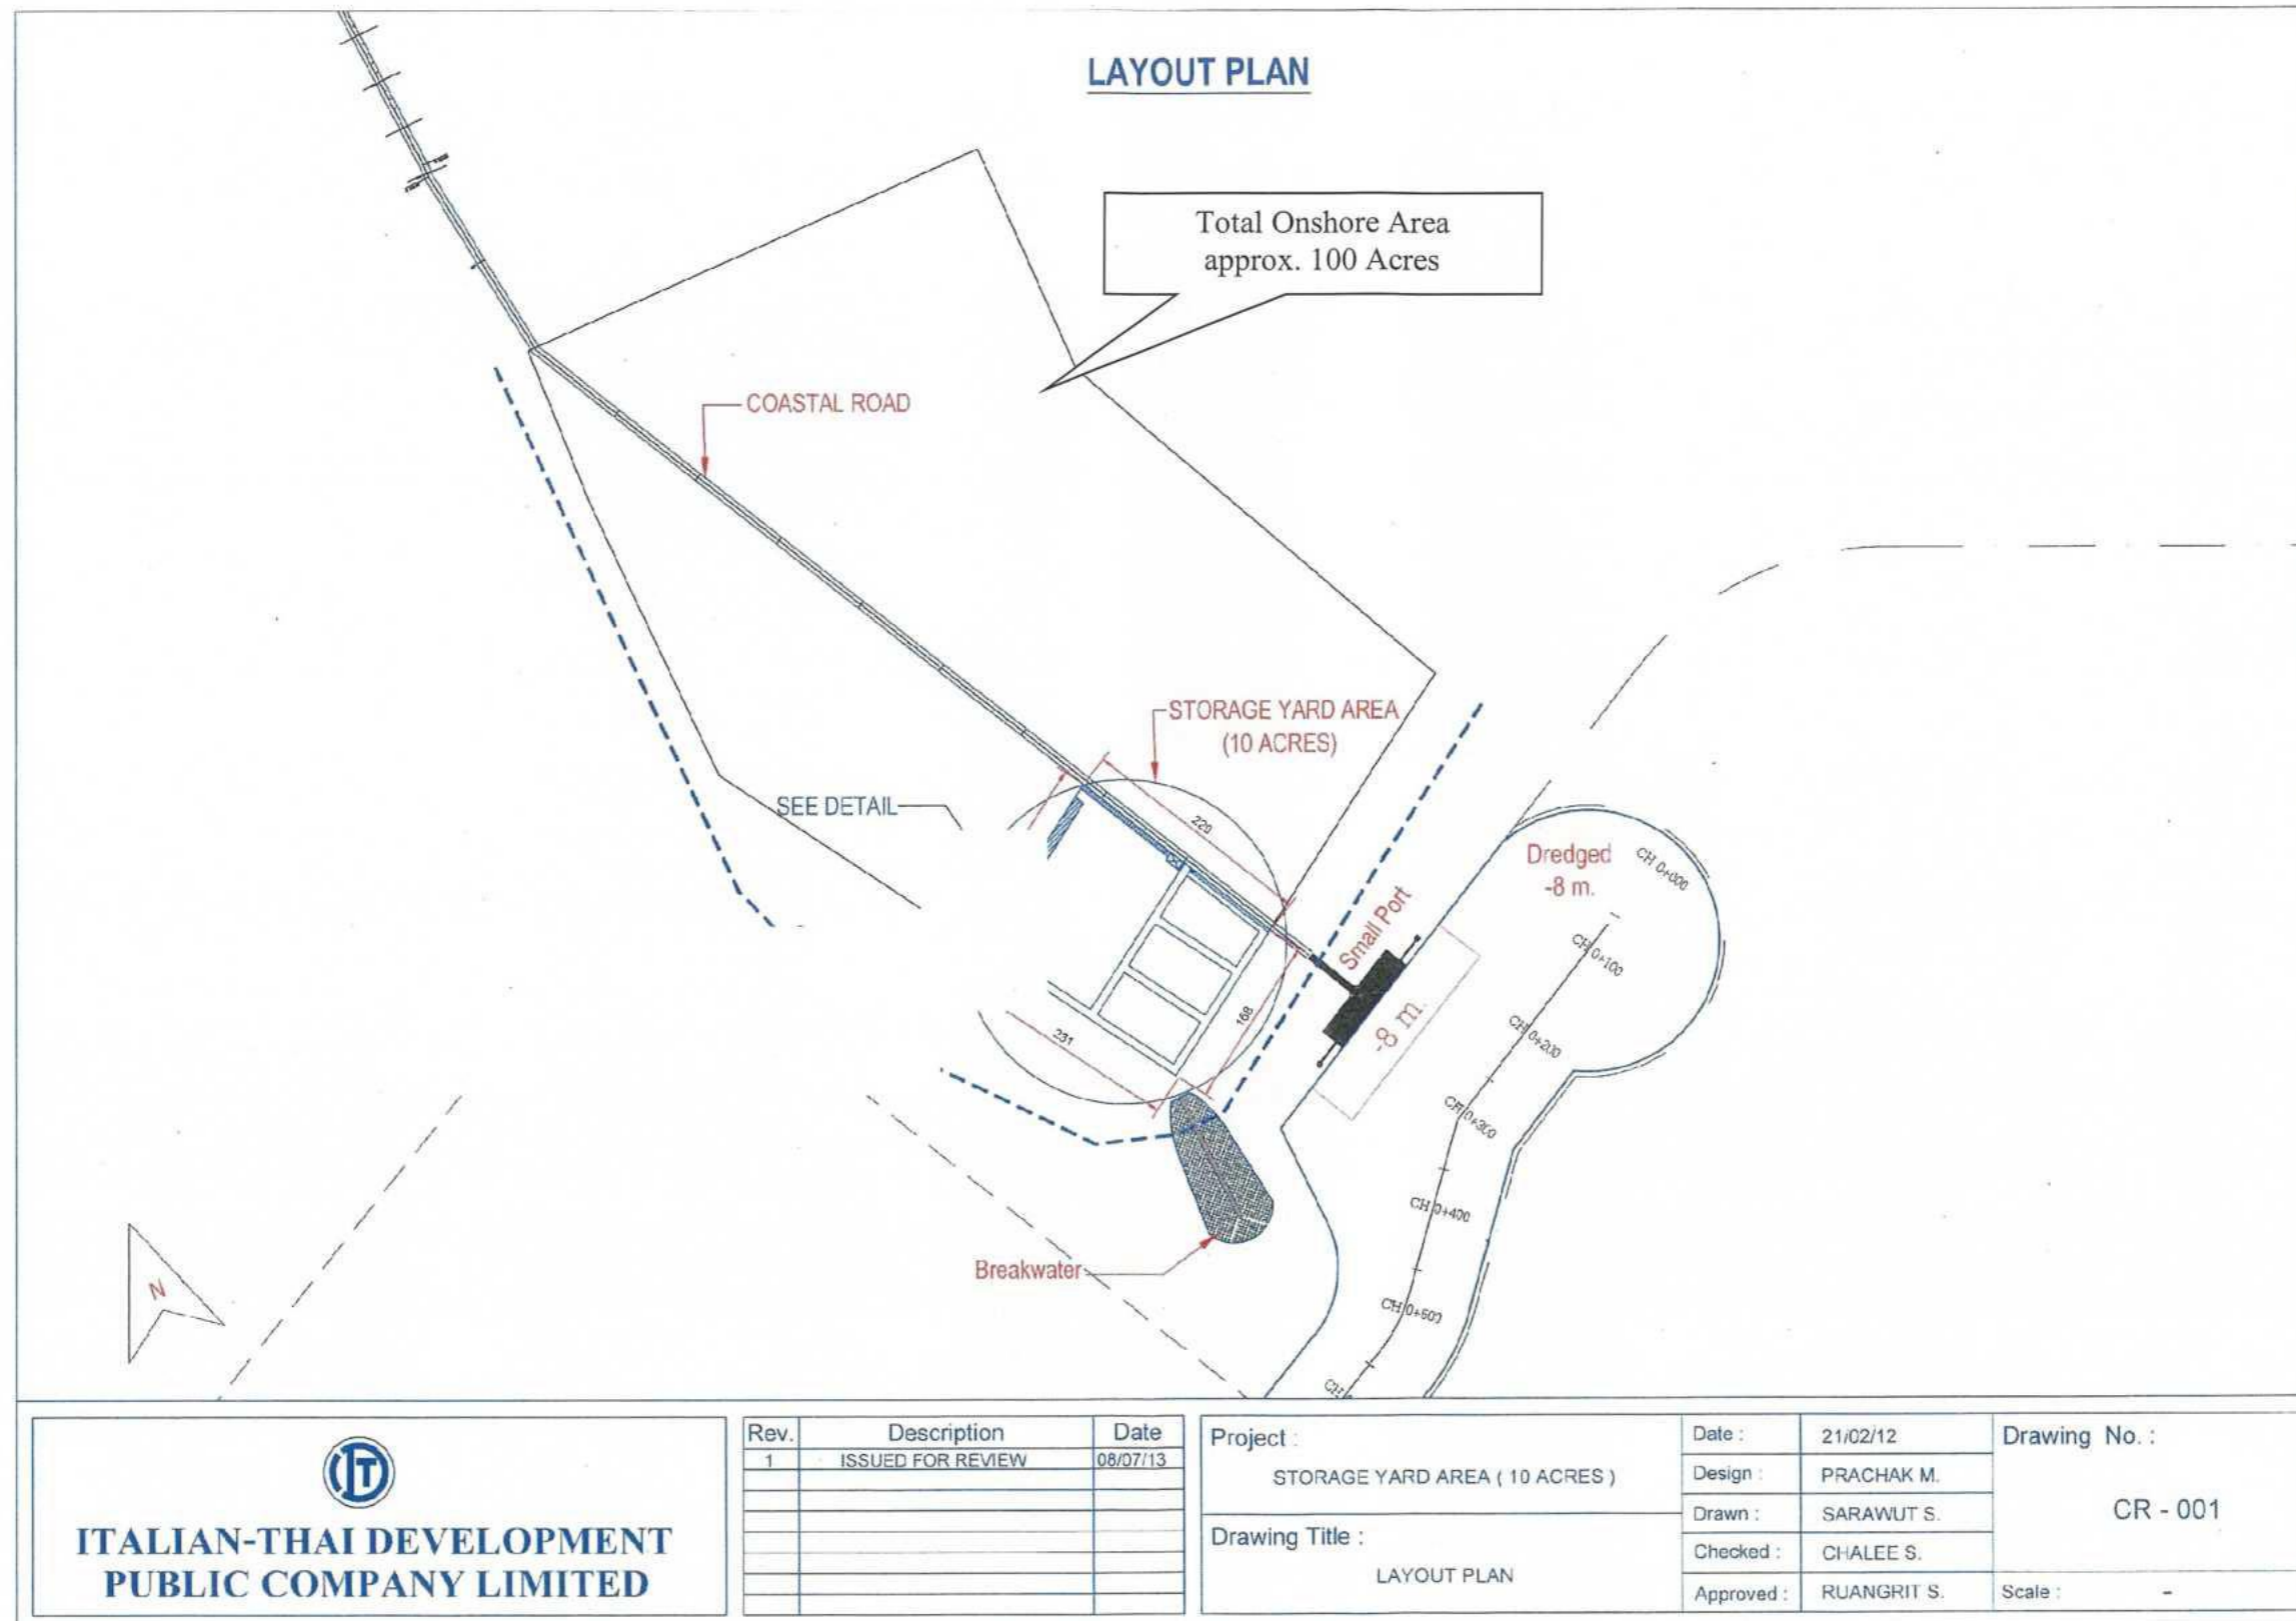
LAYOUT OF ONSHORE FACILITIES
